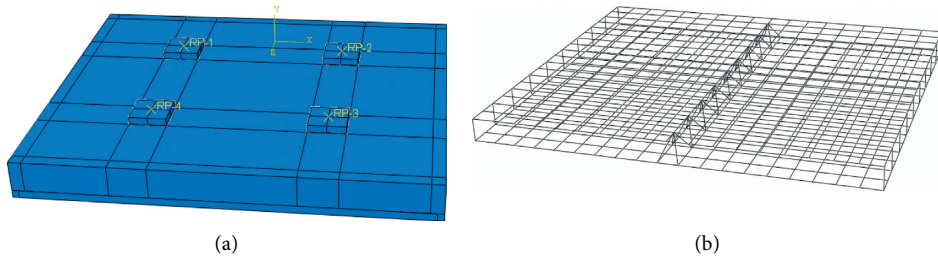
Finite element structural model: (a) concrete panel; (b) steel rack.
